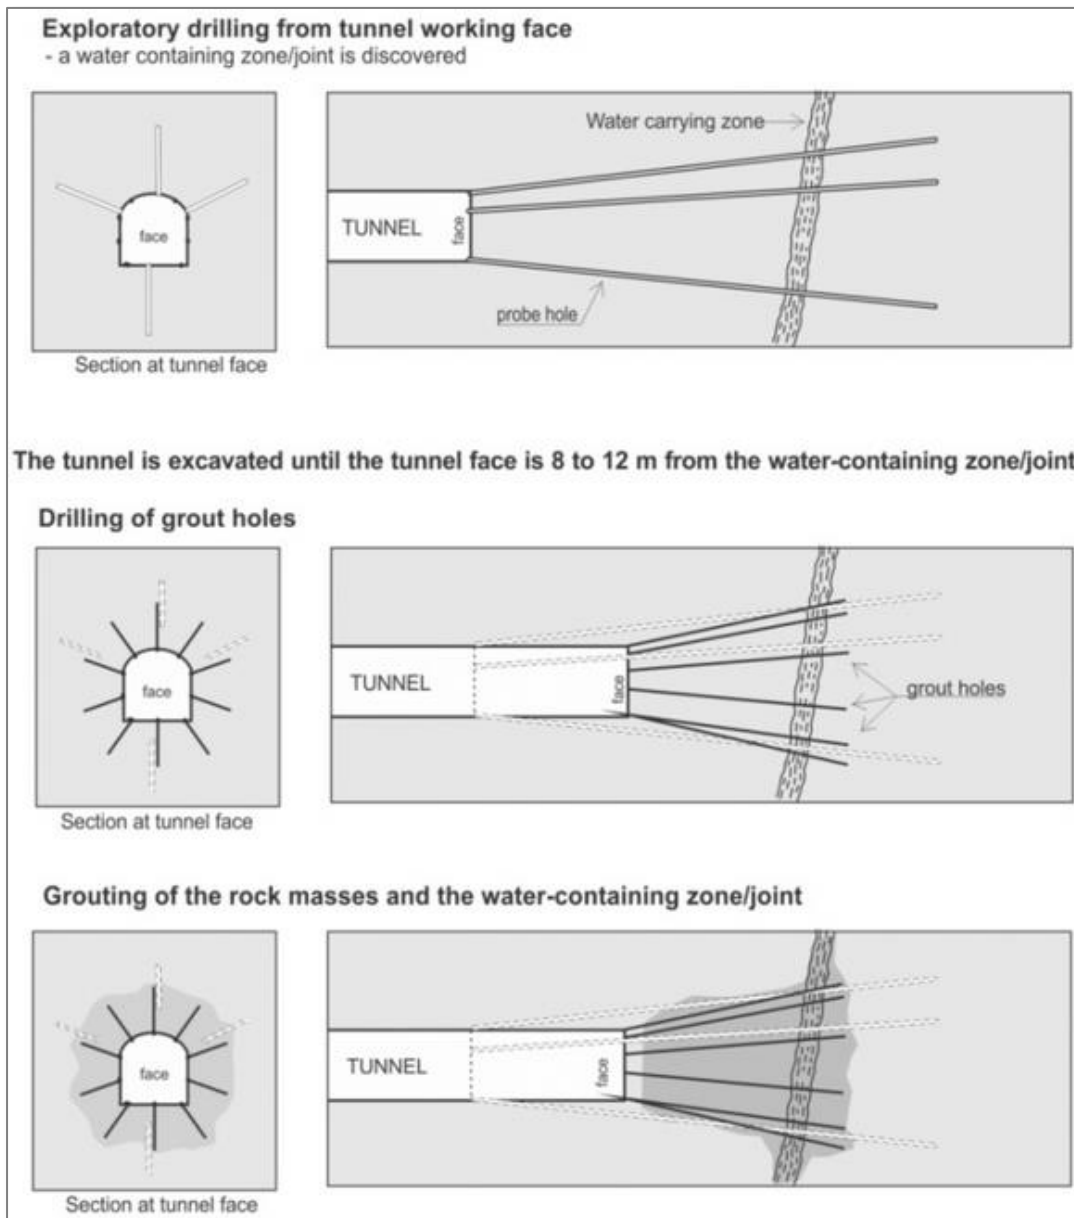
| LOCATION OF GROUTING MINING ACROSS FRACTURES (NILSEN, 2015)
